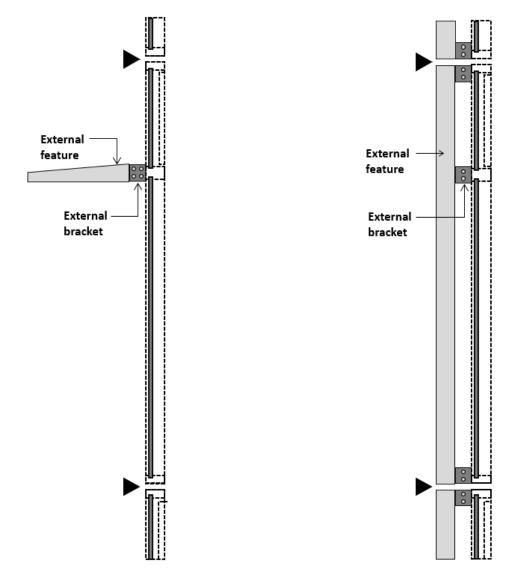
Example - section drawing (detail) on left and right illustrating connection between curtain wall and metal external feature on the exposed face of the facade. Providing metals of similar metal properties or separator/isolator helps to mitigate risk of bi-metallic corrosion.
